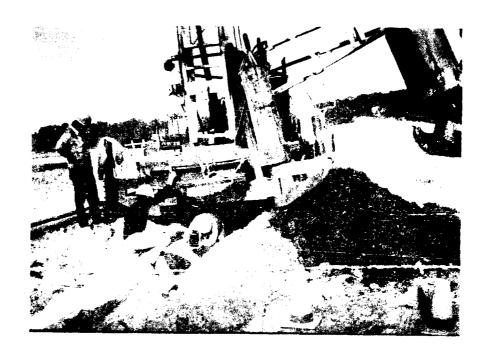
Excavation with auger in test panels (November 9, 1983)
